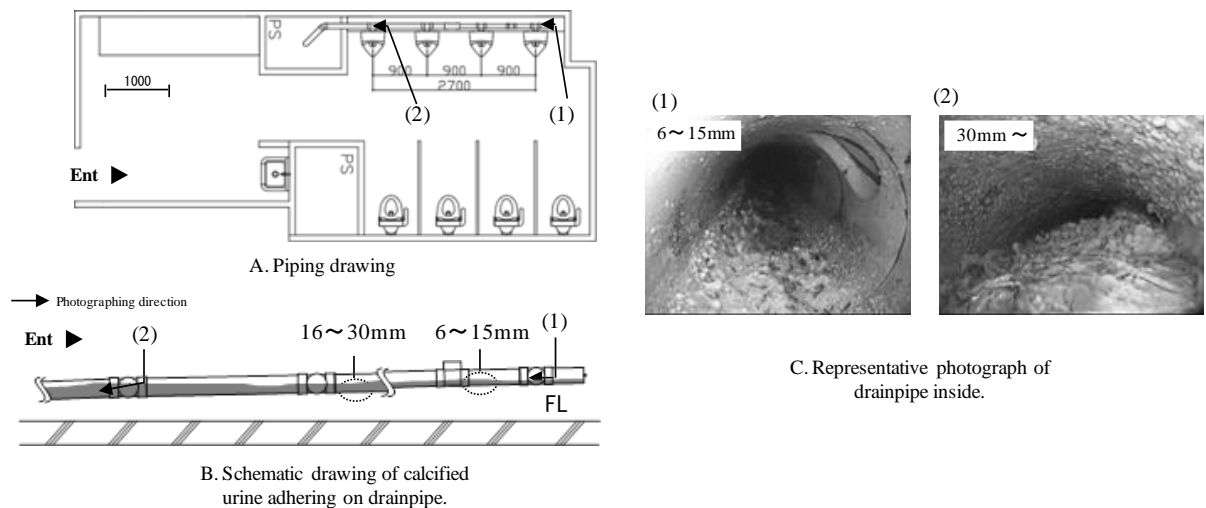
Piping drawing, schematic drawing of calcified urine and photograph of drainpipe at Office Building B
